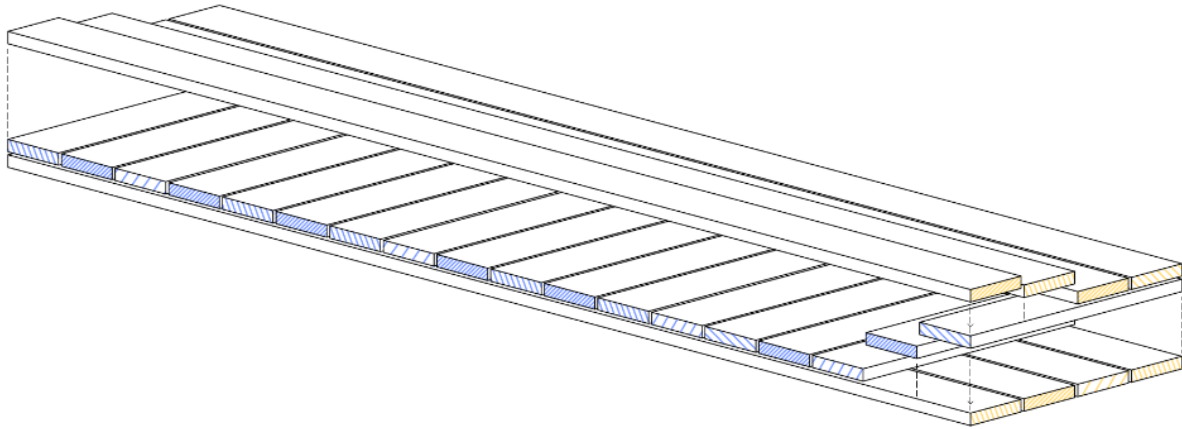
60 mm x 360 mm x 1620 mm three-layer CLT panel
